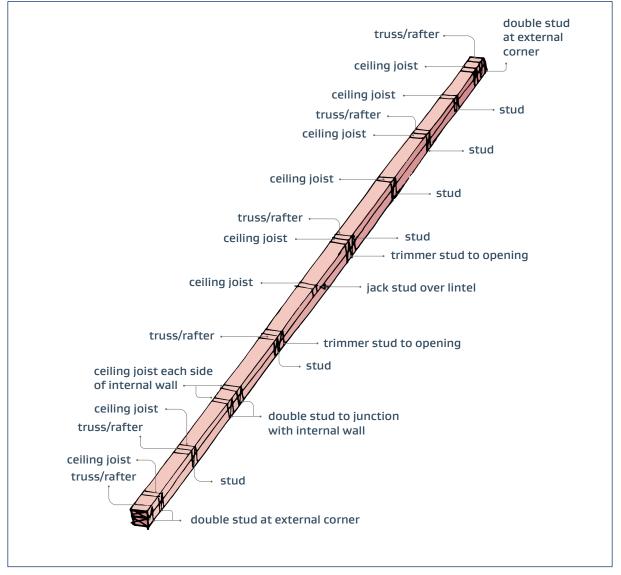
Marking the positions of other framing timbers on top and bottom plates
